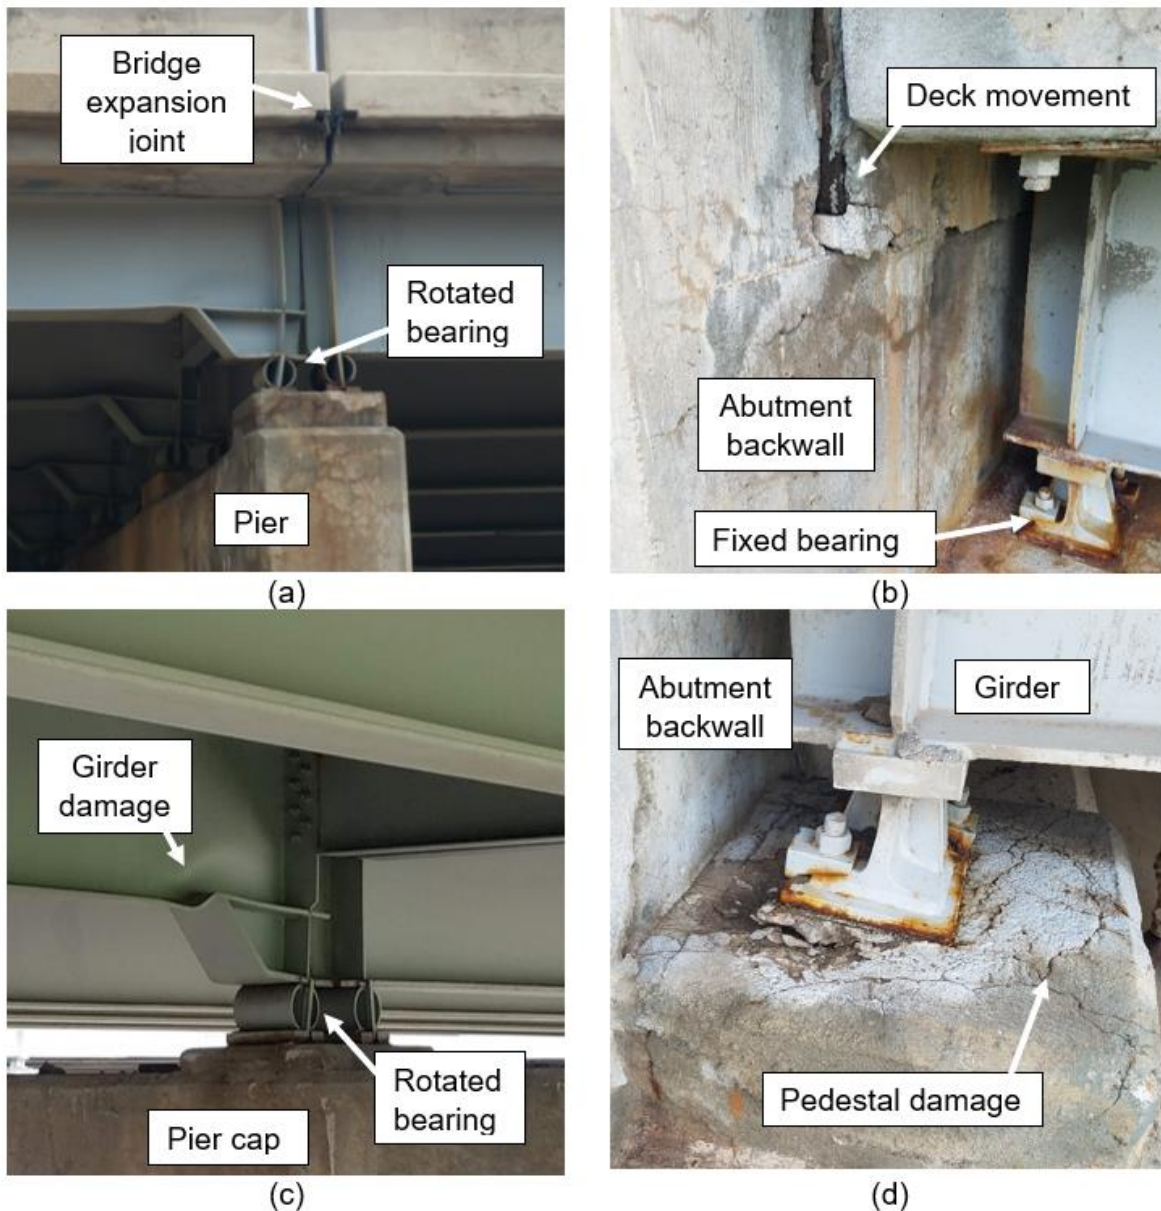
I-40 over SH-81: (a) closed expansion joint, (b) deck shoving, (c) rotated bearing, (d) pedestal damage
